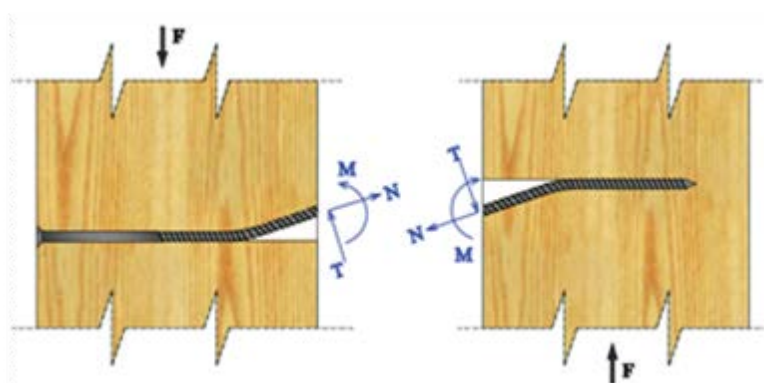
Typical connection loaded laterally and forces acting on the dowel.
